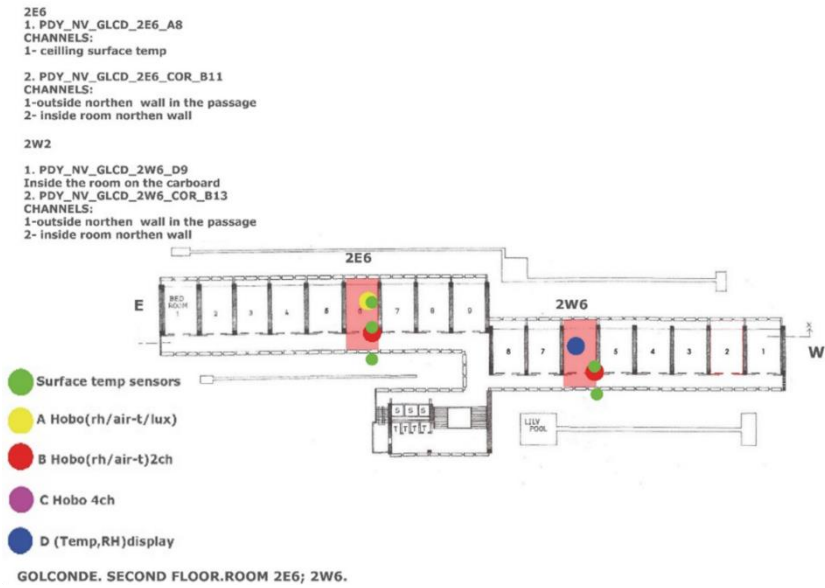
Placement of loggers on the Second Floor - Floor Plan.
